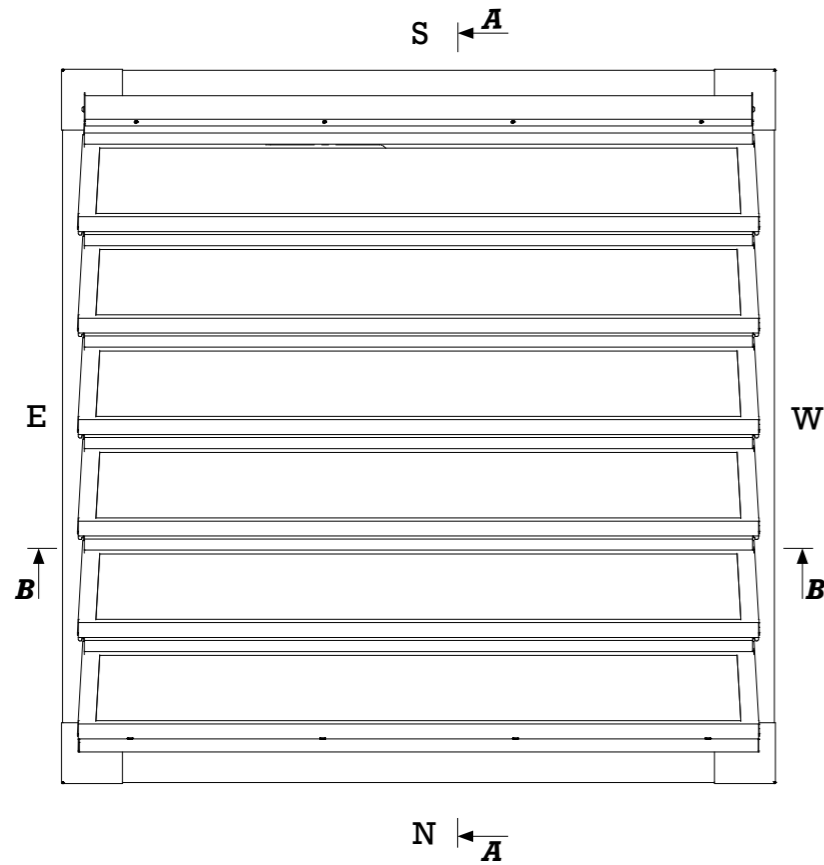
Top view of mcr LAM louvered vent in closed position (façade installation)
